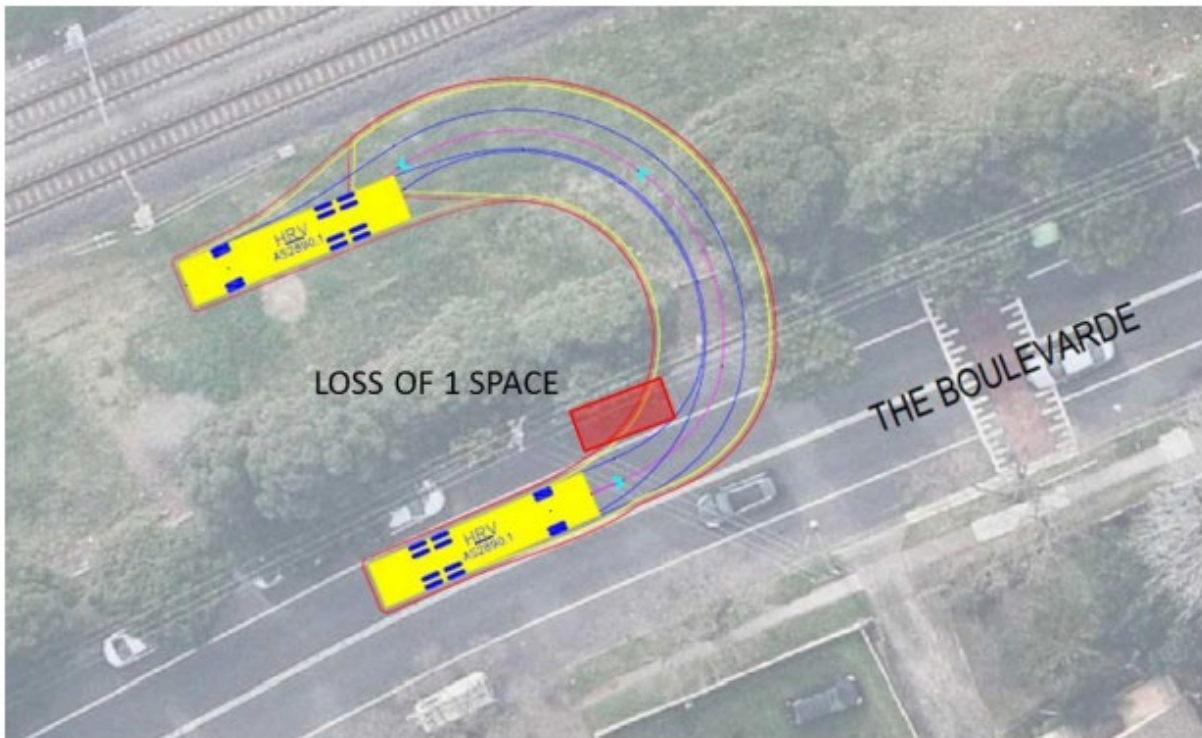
BE9 – M24 14.229U Parking Space Loss
